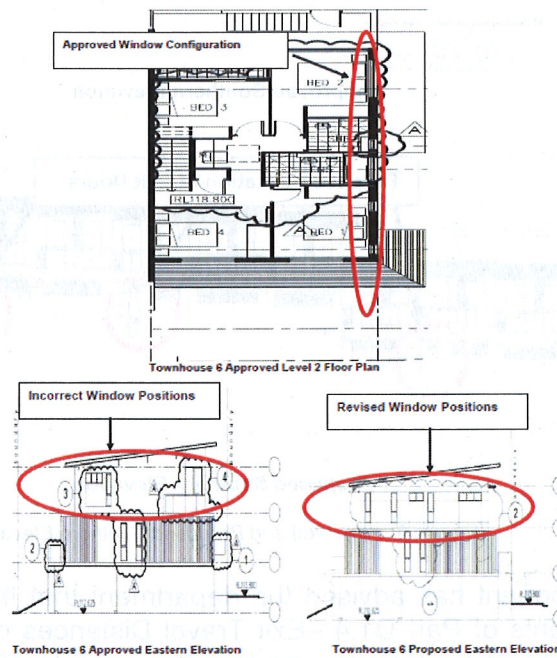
Proposed Revisions to the Eastern Elevation to Correct Drawing Errors
